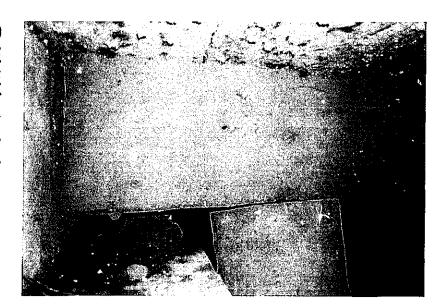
BENT 1 TO RIGHT POSSIBLE TEREDO MARKS FACING WEST
